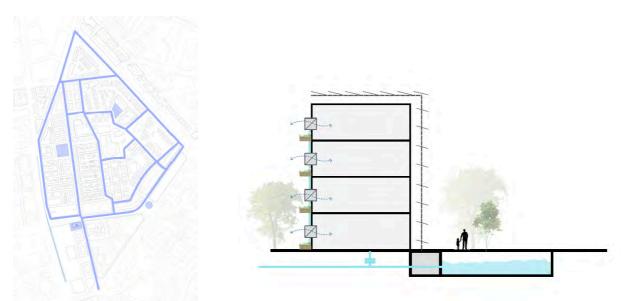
Road cisterns for storm water (left) and how collected rain water can be used for buildings and green, and condensation water for plants on buildings (right) – image by Roadshow Facilitators
